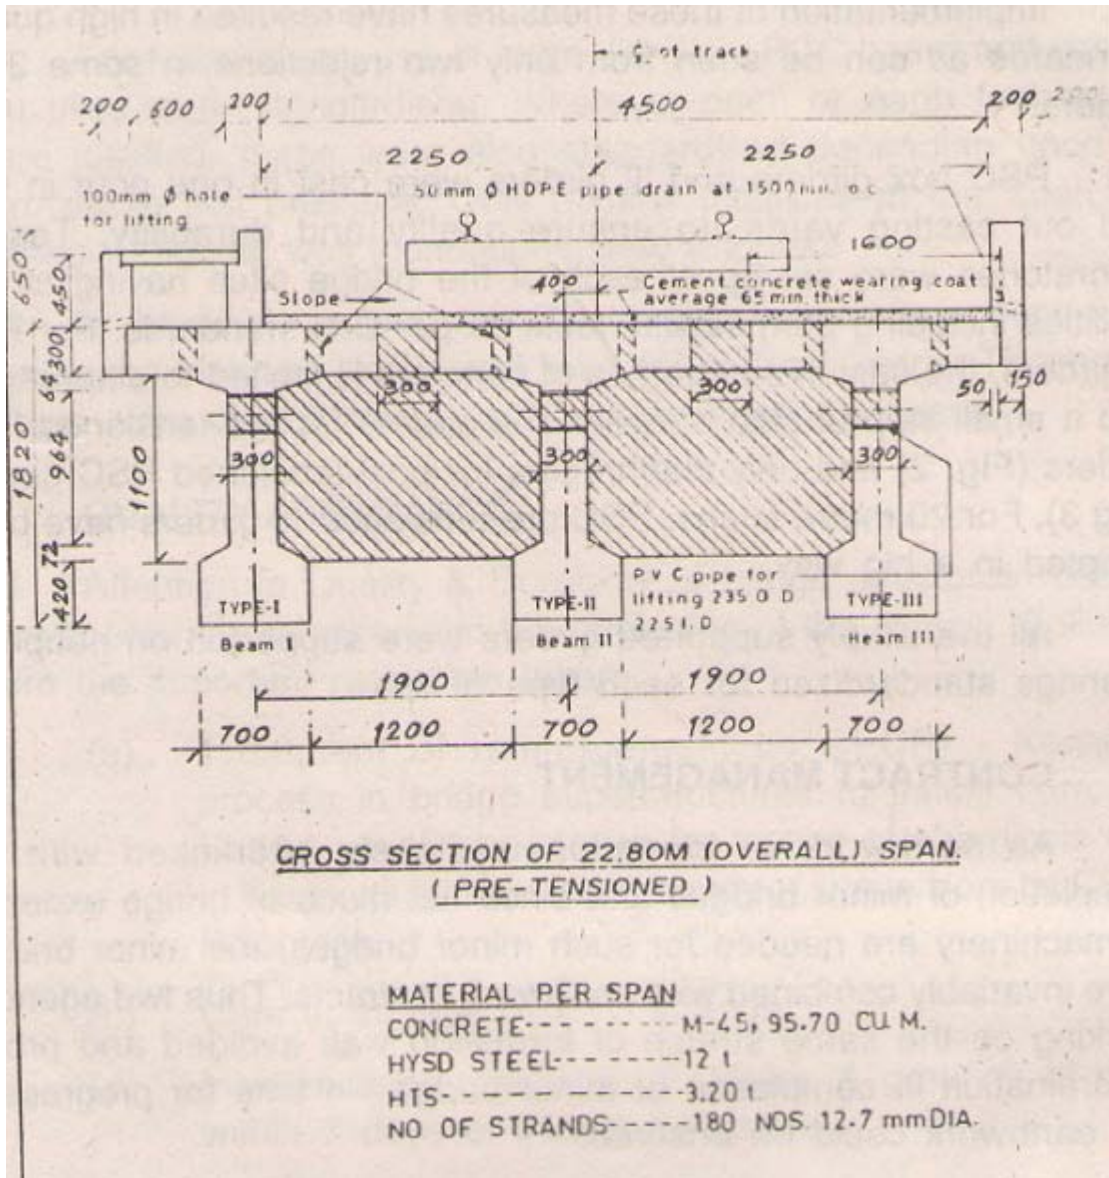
22.80m (Overall) Span PSC Girder (Pre-Tensioned)
